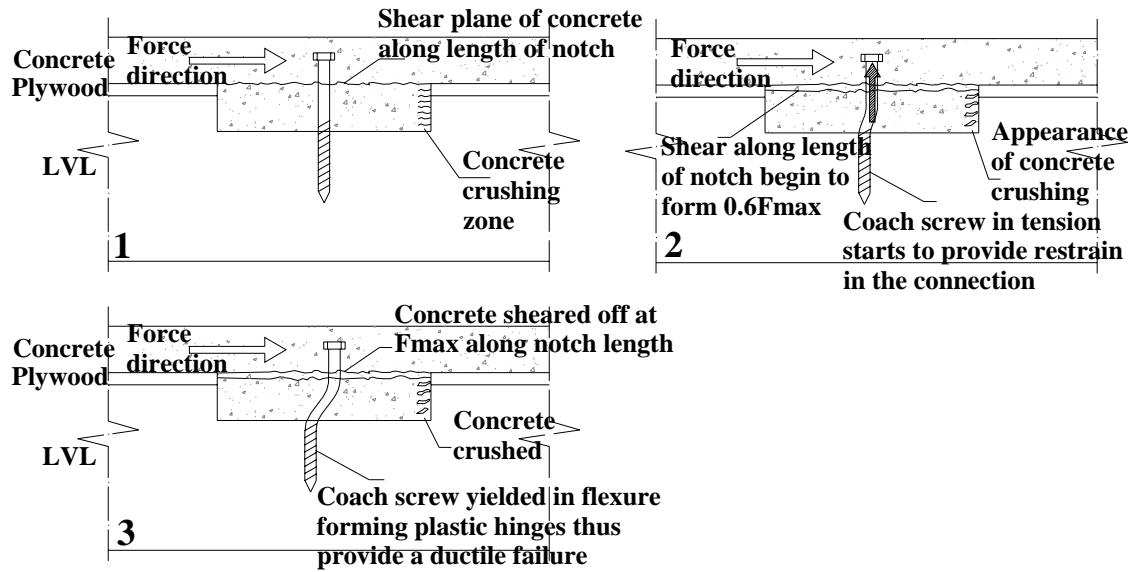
Experimental failure mechanism of notched connection with coach screw
